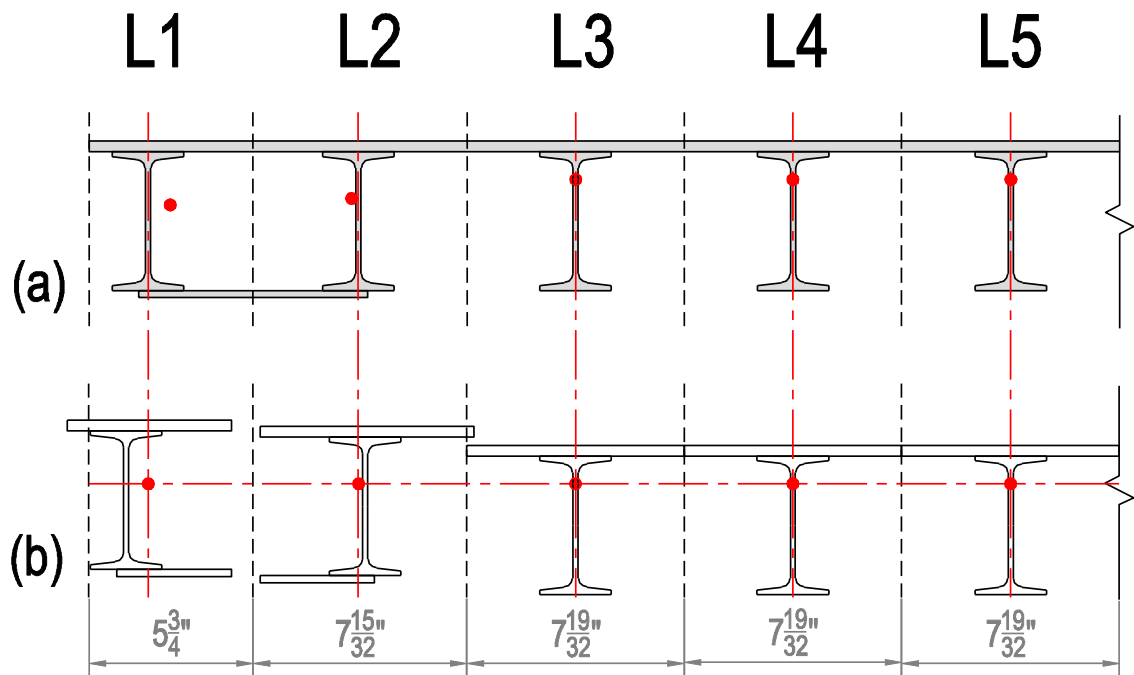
Division of bridge deck into longitudinal members (a) Longitudinal members with cover plate (b) Placement of sections in grillage layout
